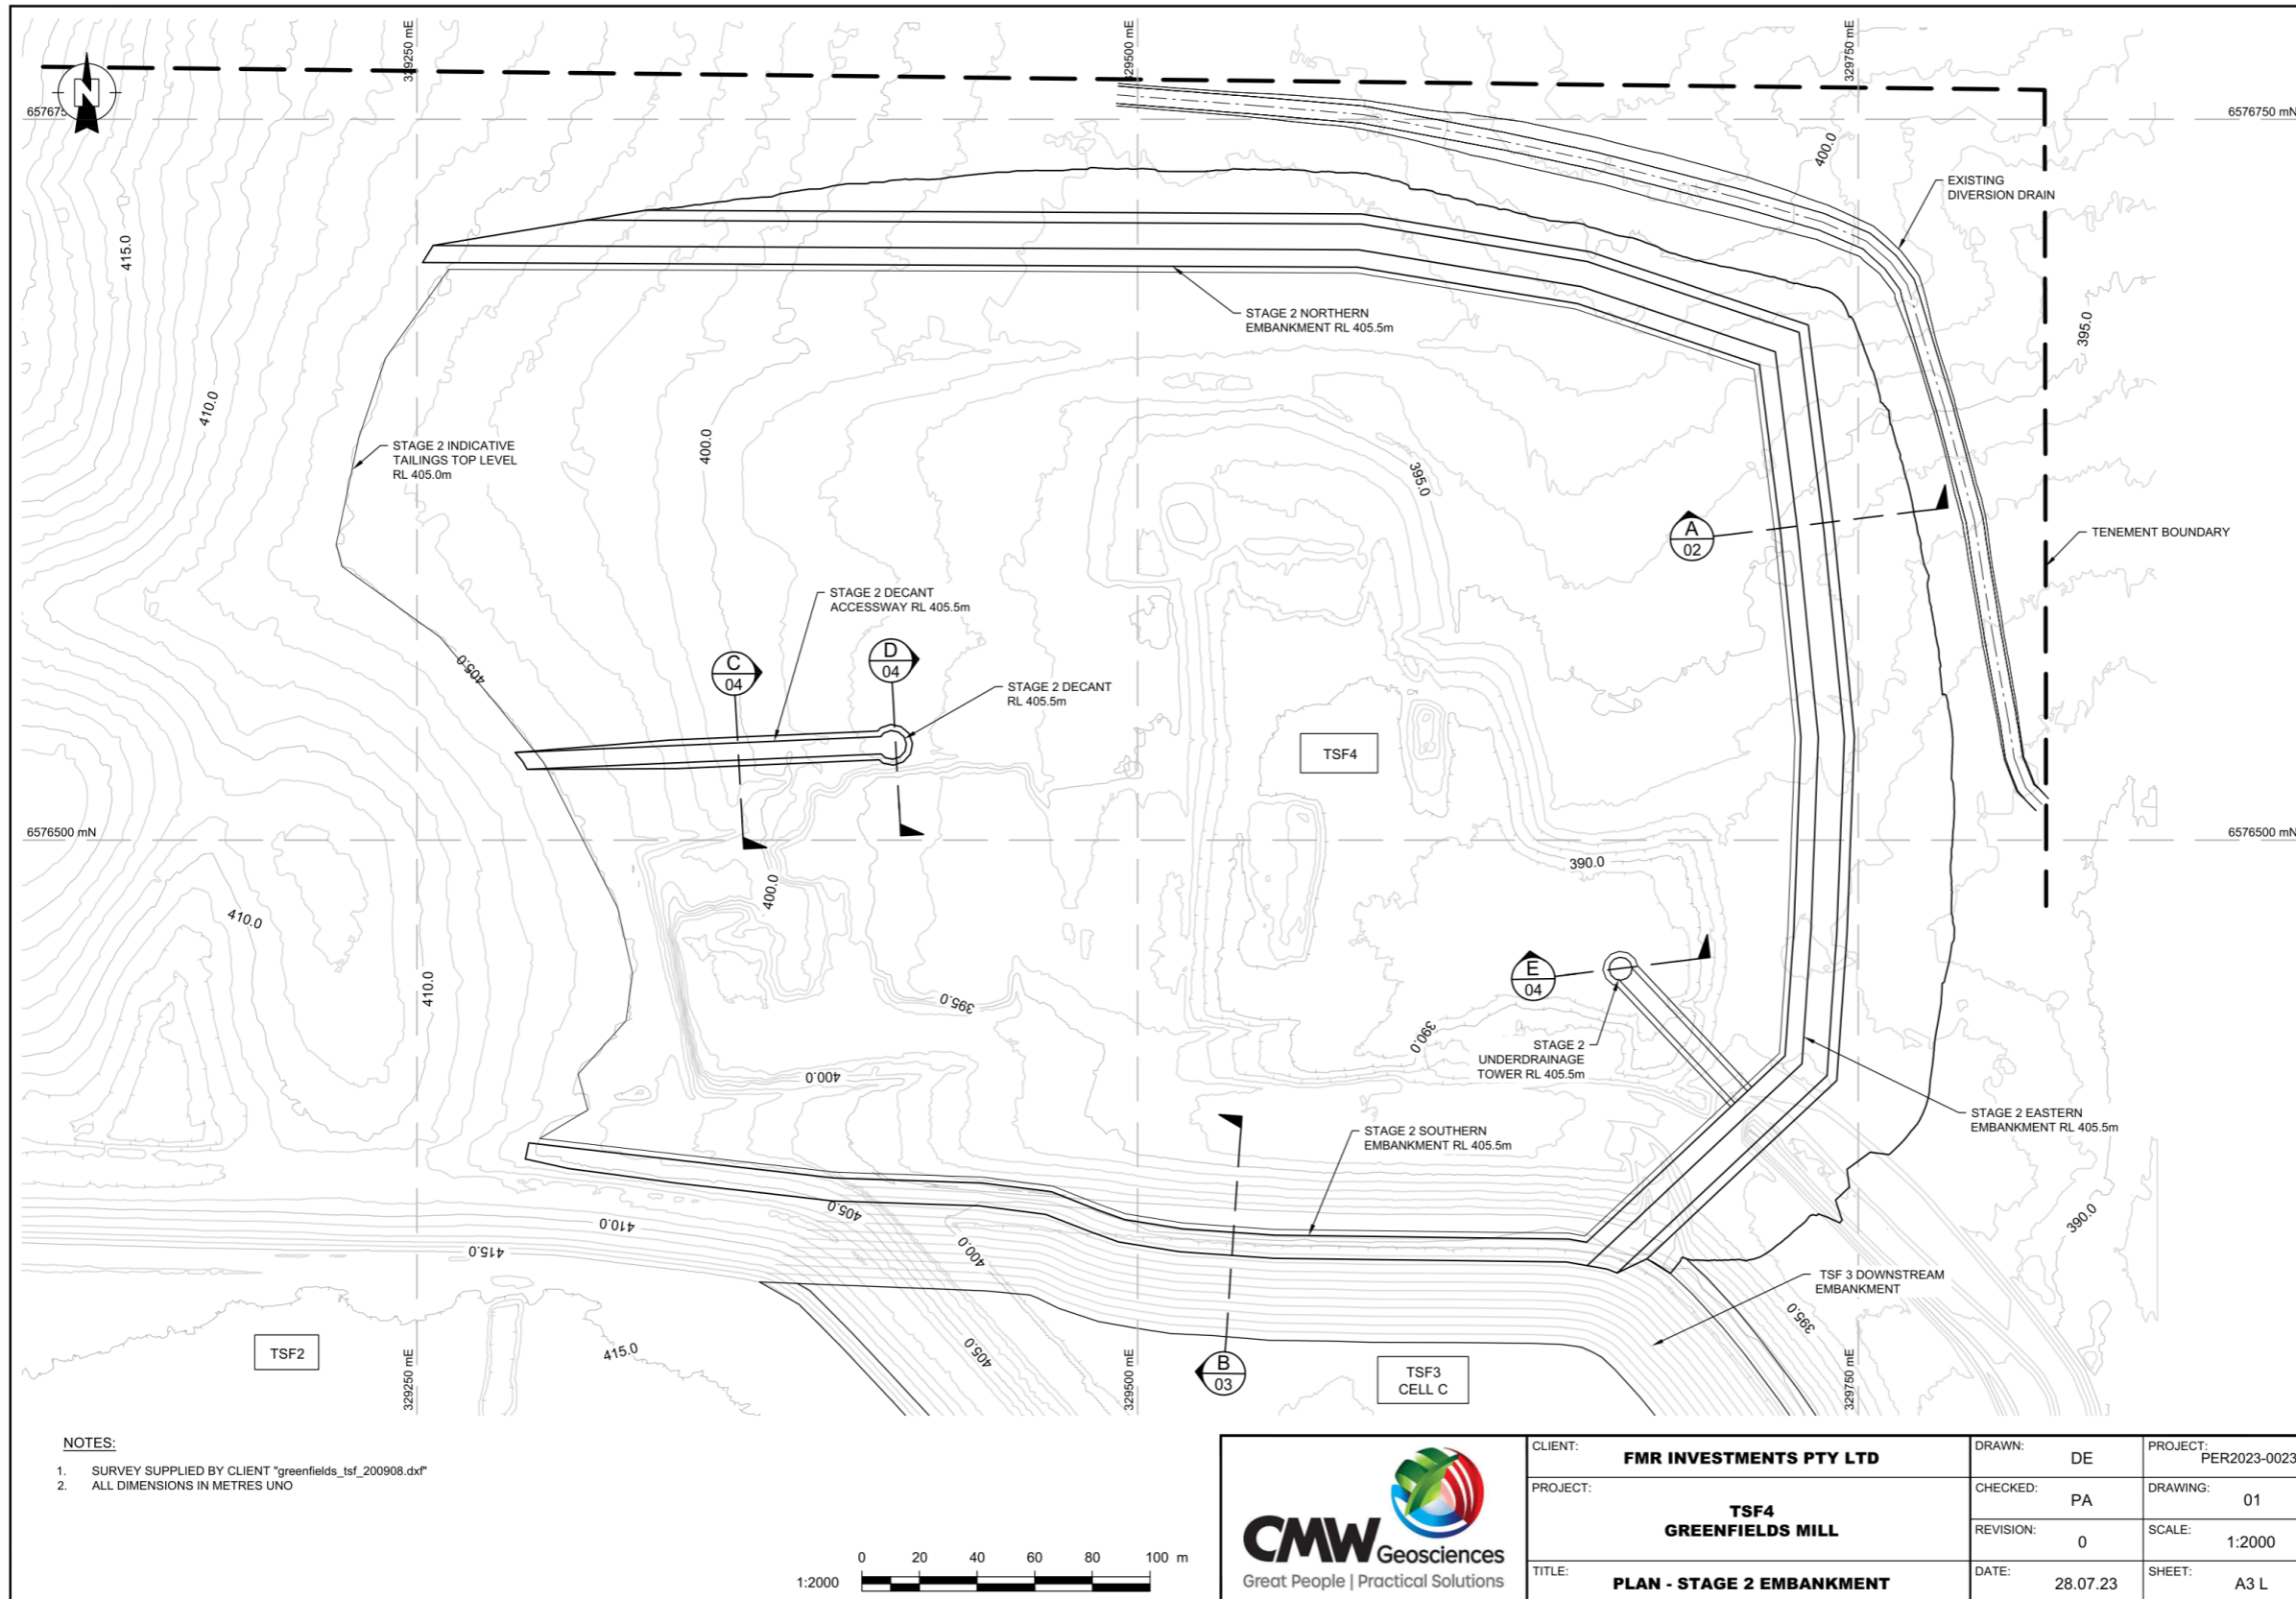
Design drawing for TSF4 Stage 2 embankment raise
